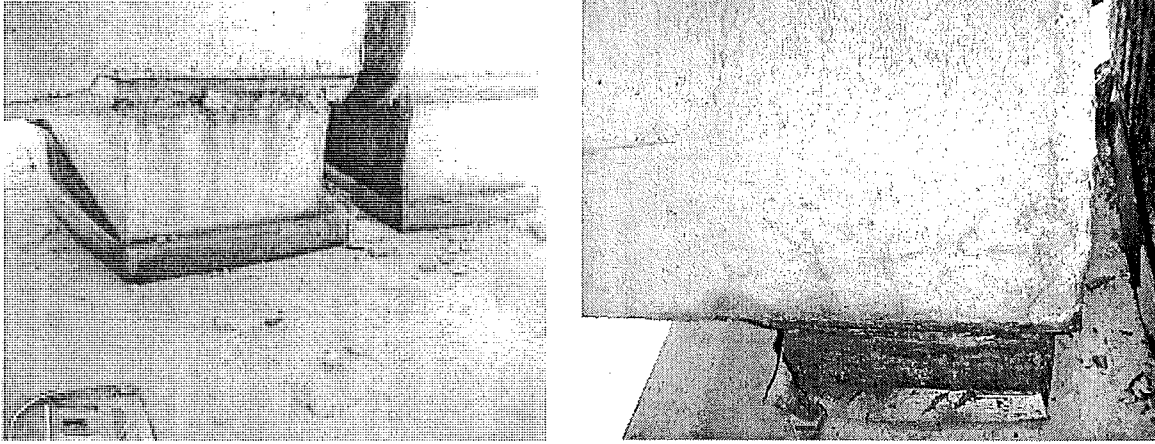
“Not vulnerable” Prestressed Concrete I-Beam
